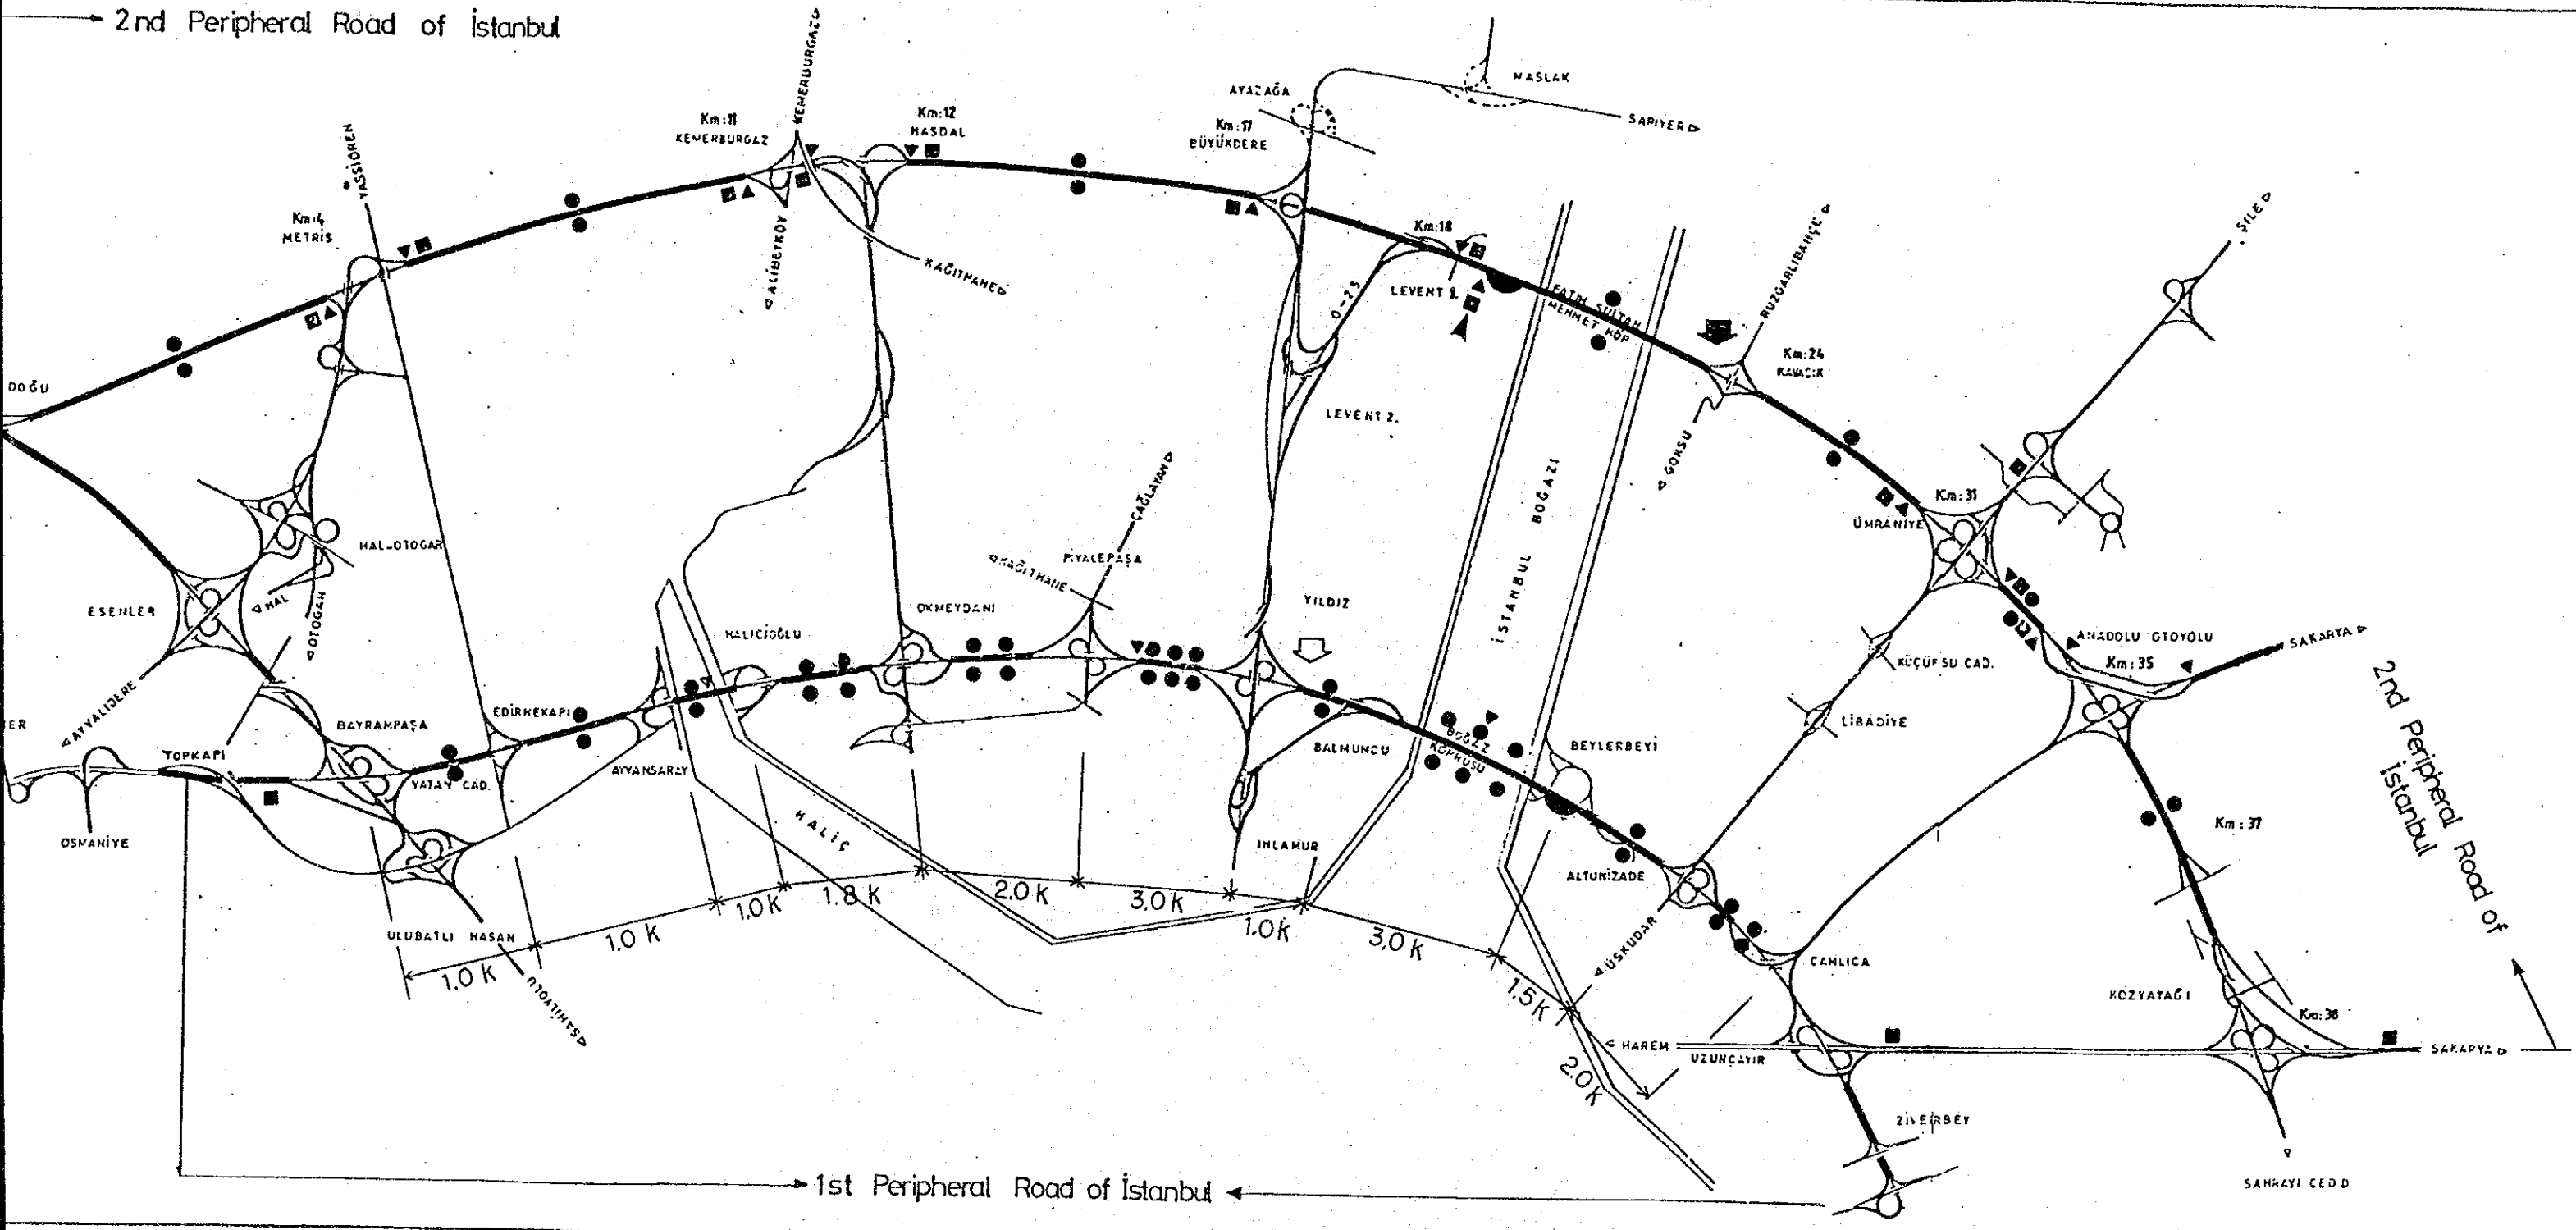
Proposed Facilities Installation Plan for Traffic Management and Operations System on KINALI - SAKARYA Motorway
